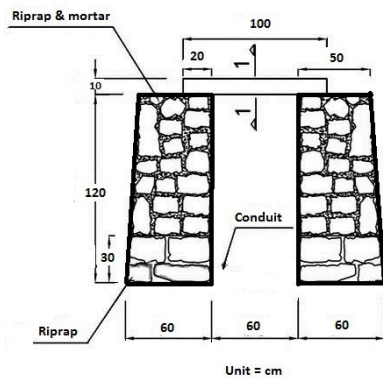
Typical cross section of the scheme; the concrete slabs (Section 1-1 in the figure) will be covered by aggregated soil.
